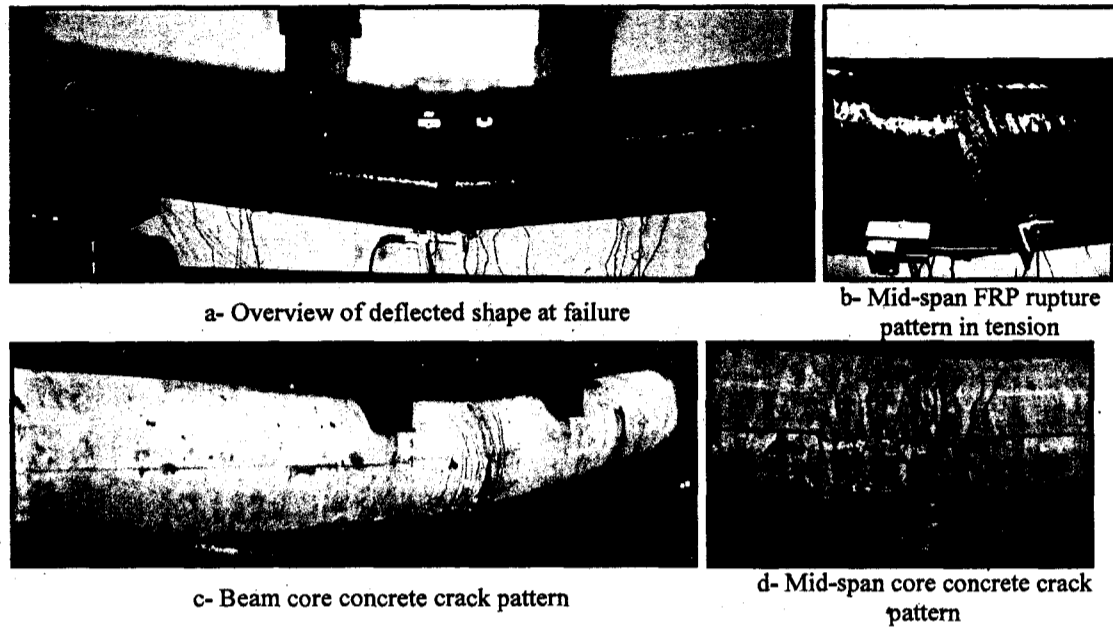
Failure mode and concrete core crack pattern of RCFFT beam D-G-N
